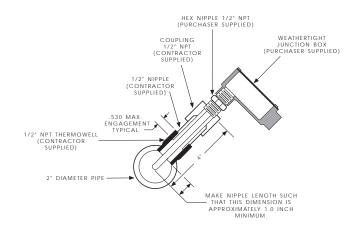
T-44S and T-44L Fluid Immersion Temperature Sensor
